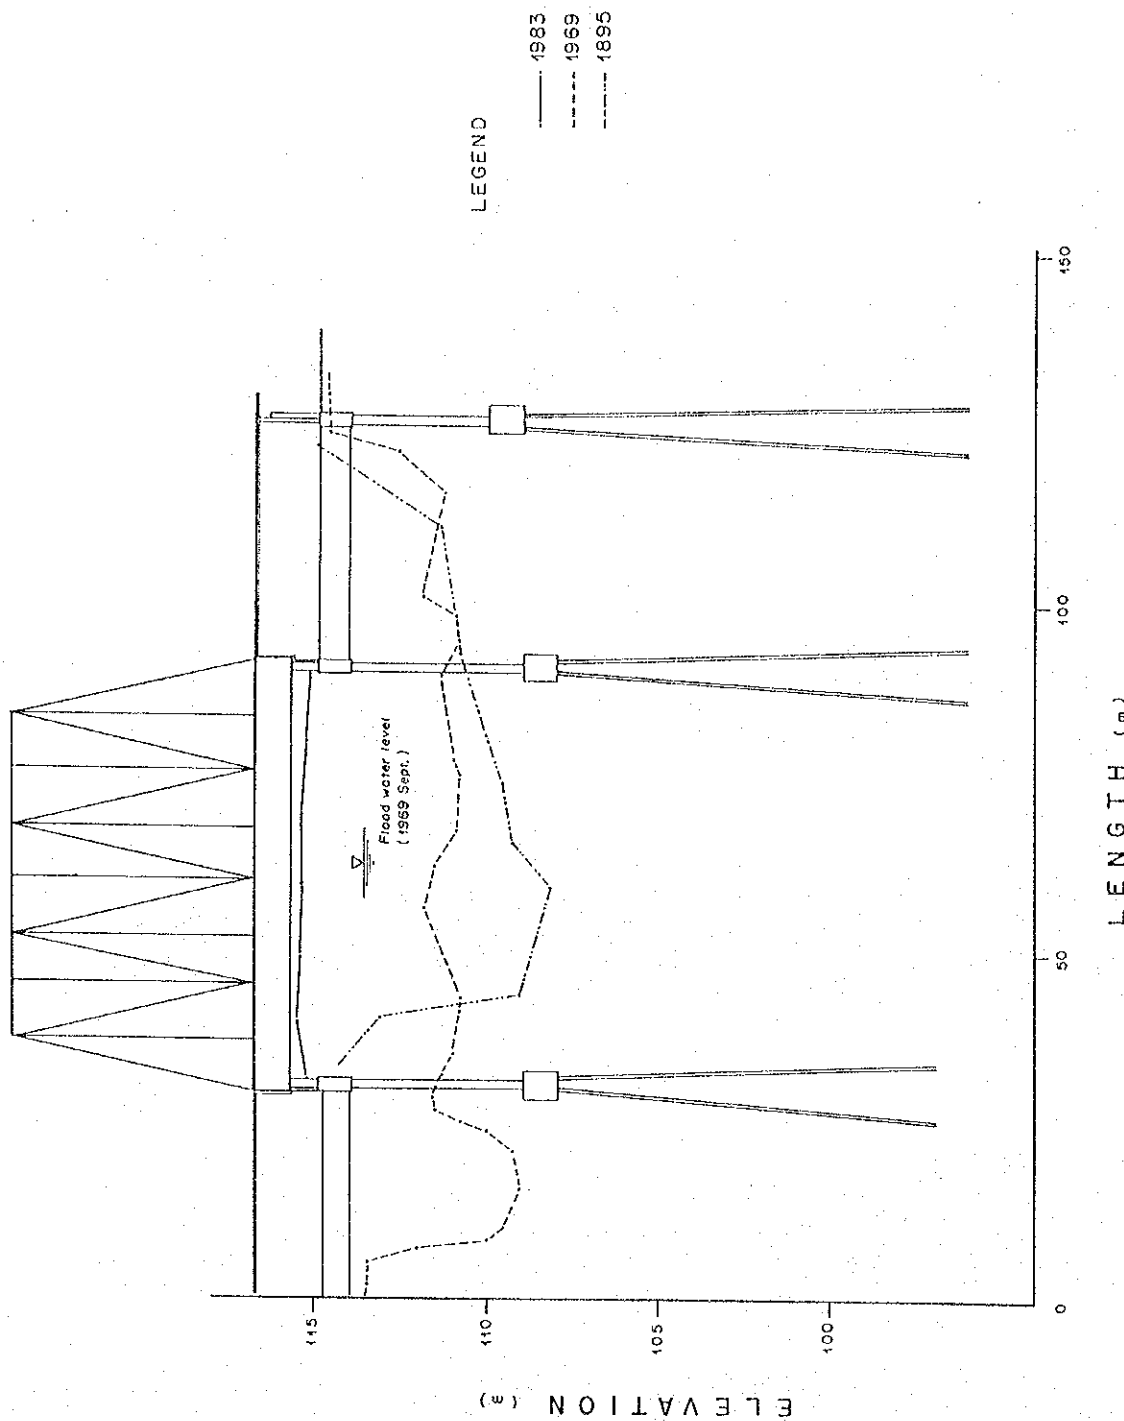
TRANSITION OF CROSS-SECTION AT RAILWAY BRIDGE IN ACHIGUATE RIVER
